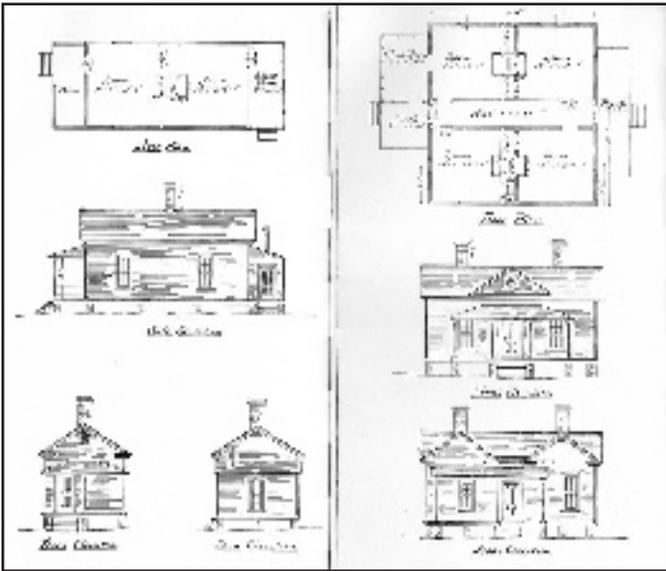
Two more plans from Tompkins' 1900 book: a shotgun style two-room house, \$250; and a four-room center hall plan house, \$400.
